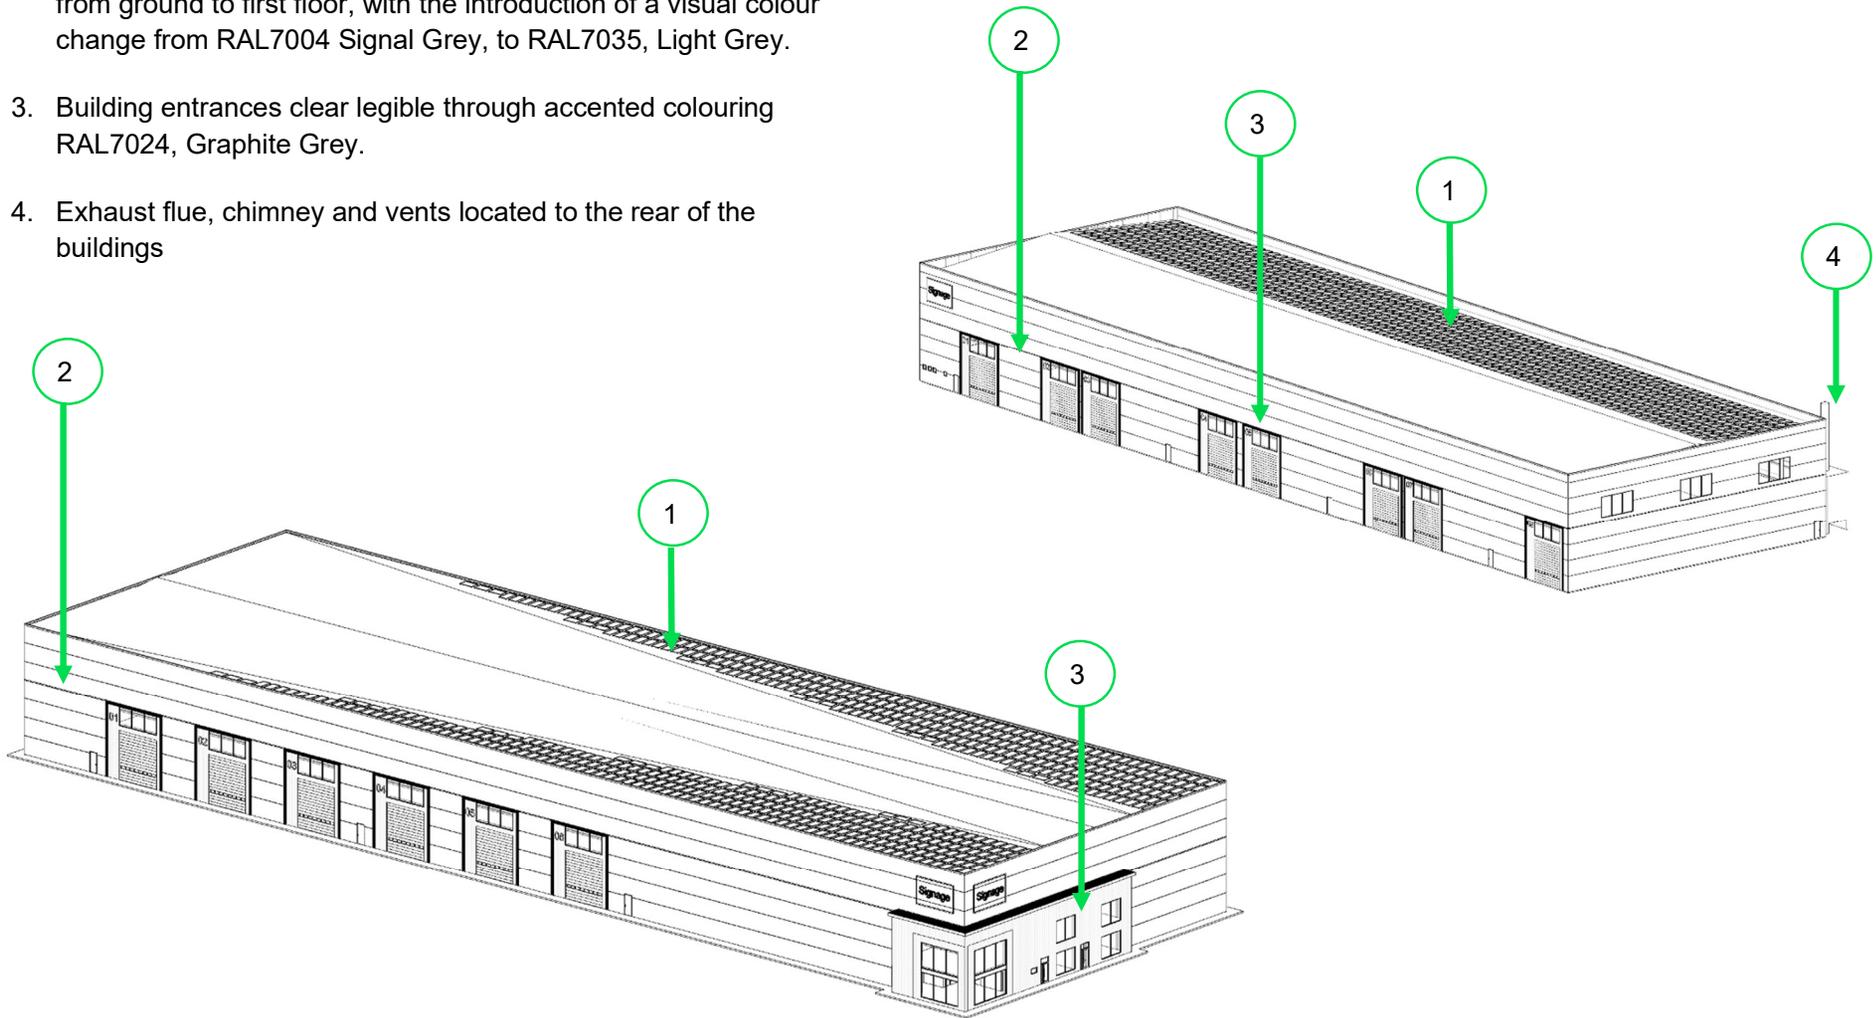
PROPOSED FOOD CONTAINER PLANT BUILDING ELEVATION DESIGN
